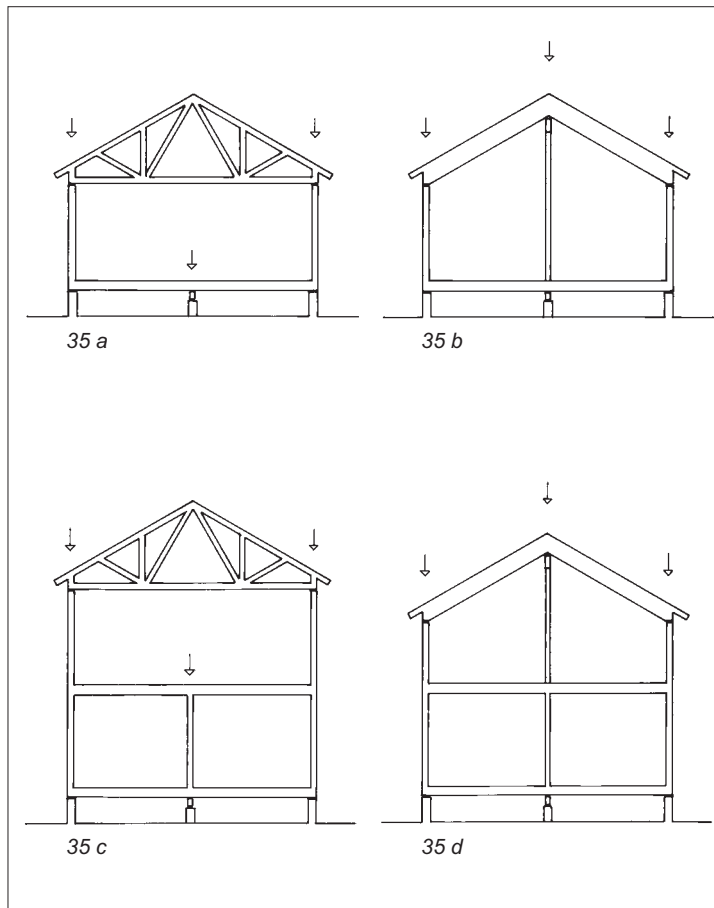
a-d. Structural grid, the requirement and position of load-bearing structures in single storey and two storey houses.
